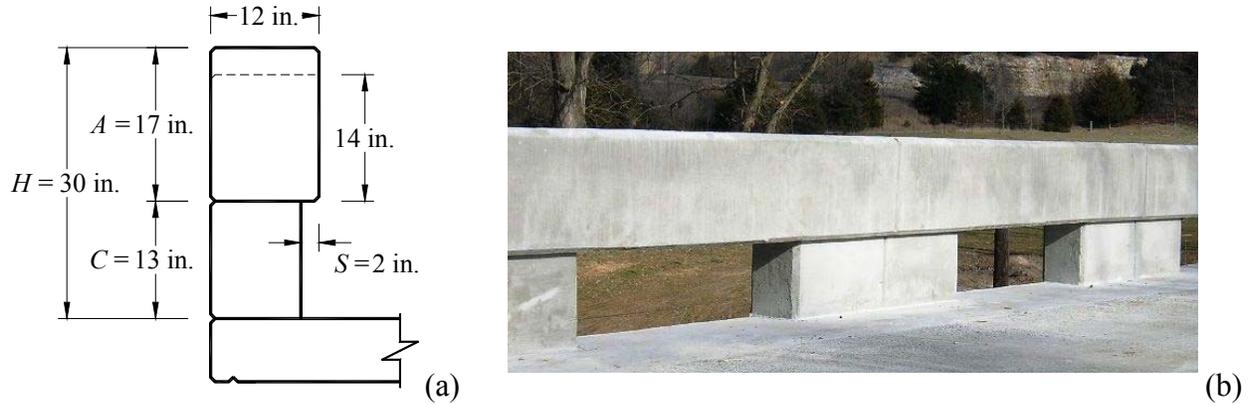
Geometry of GFRP RC MKCR: thru-section profile (a); and photograph of railing with post and gap opening length of 4 ft (b).
